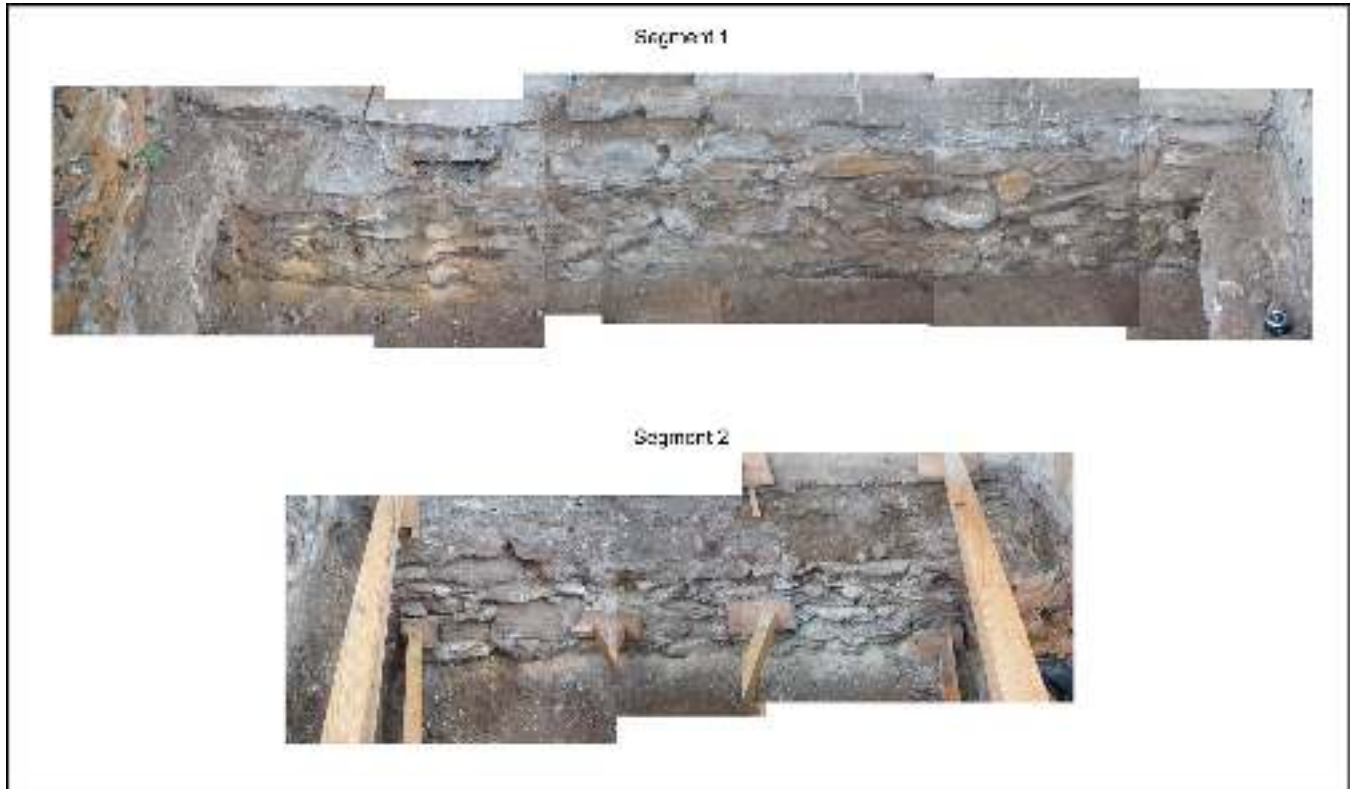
Segments 1 and 2 of the foundation of the east wall of the church, southern portion.
